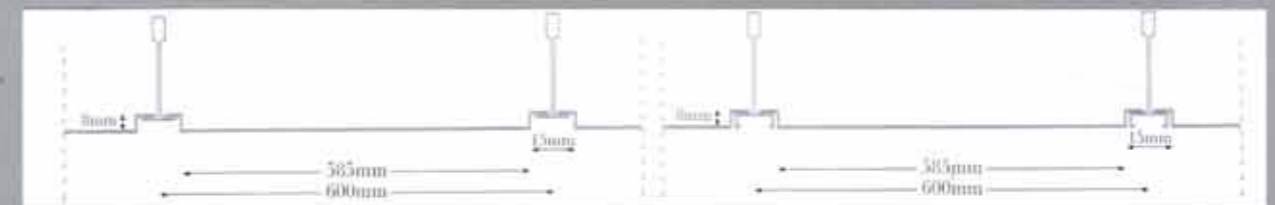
DETAILS SECTION FOR T-24, T-15 & T-15 ULTRALINE RUNNER
